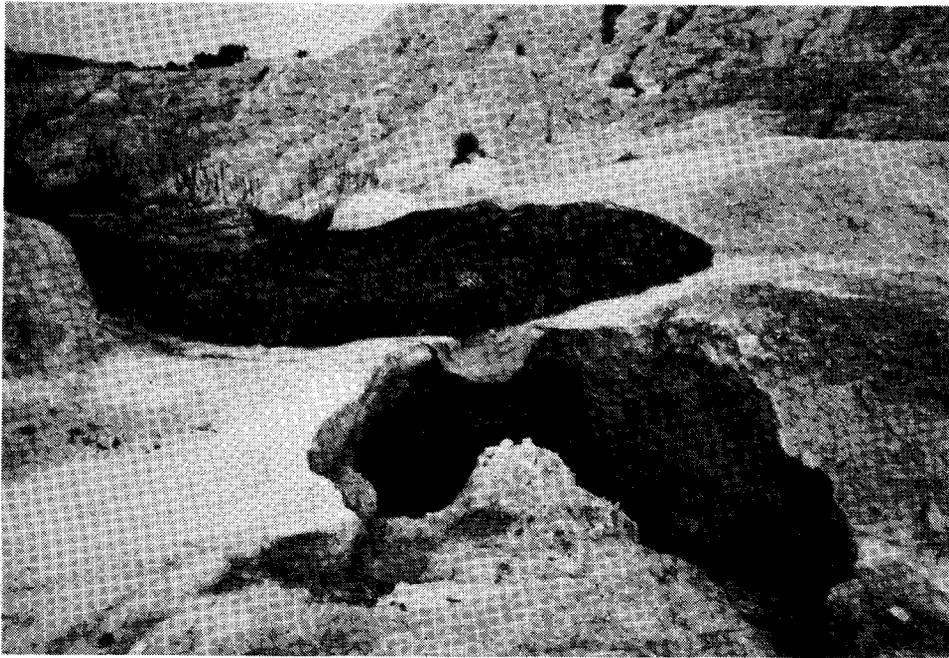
Failure by piping erosion of a filter dam constructed of gold slimes and built on a slimes foundation
